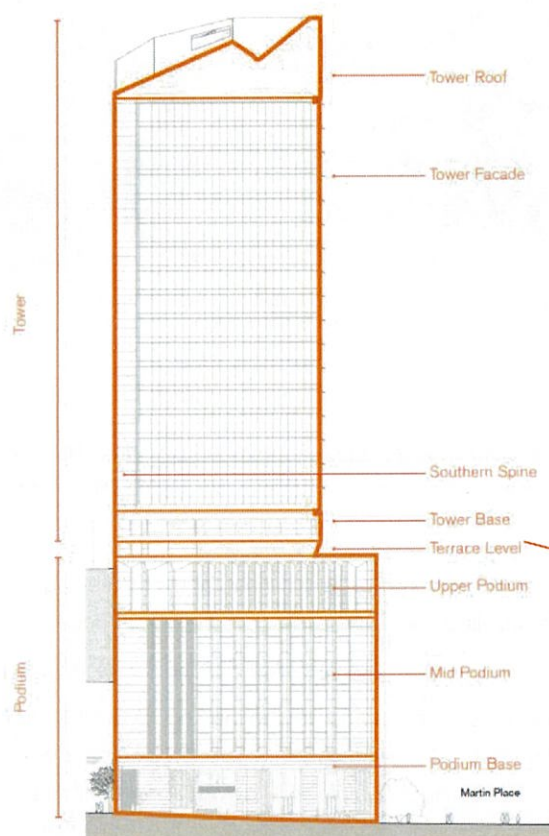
| Eastern elevation with key podium and tower elements highlighted (Source: Applicant's RtS)
